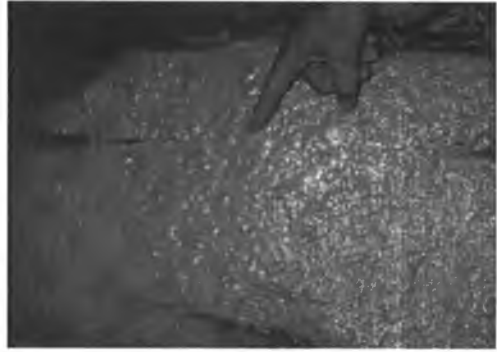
Evermine bridging a 5 mm (+) wide crack in the rockwall
